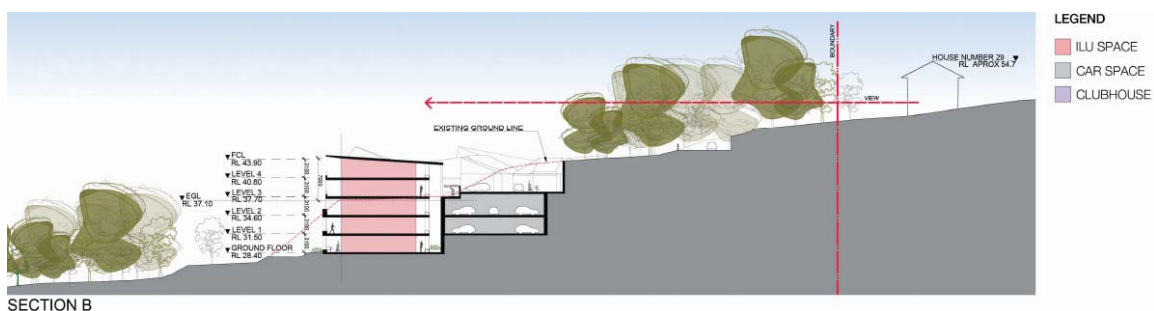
Indicative section plan of scheme (source: Marchese Partners).
